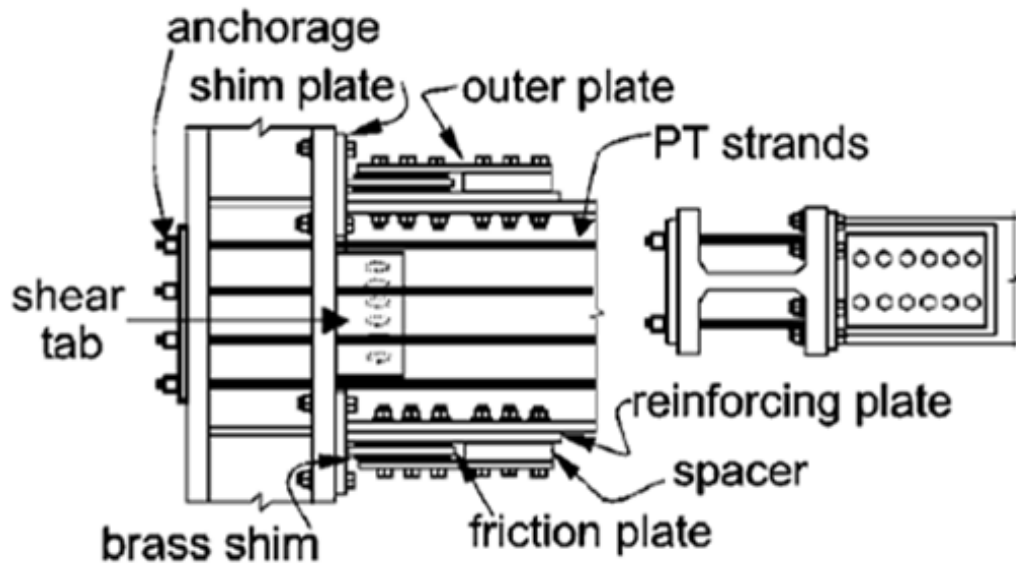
PT friction damped connection details (Rojas et al 2005)
